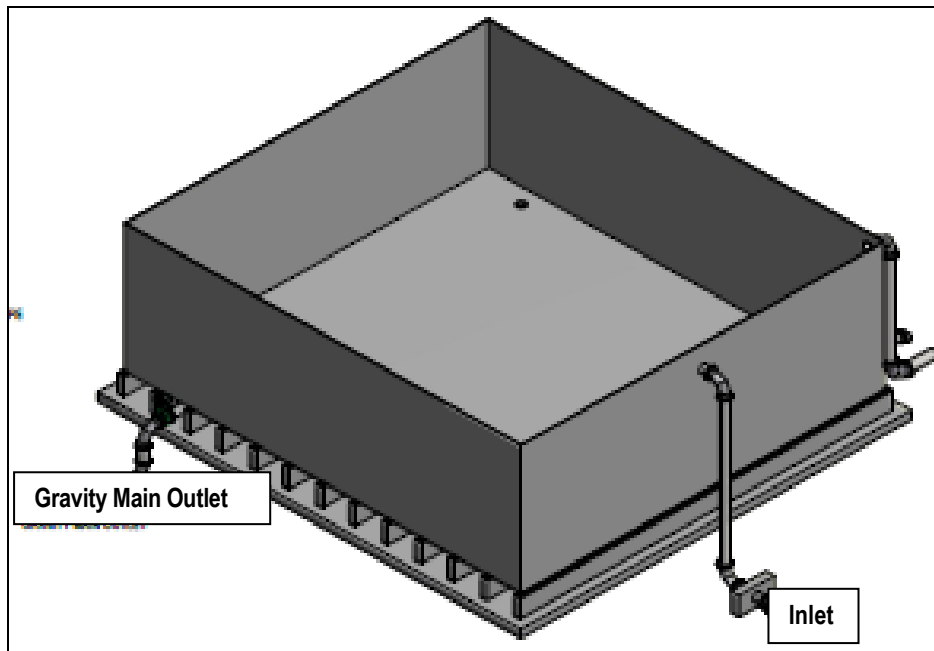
Isometric view of the proposed 1 ML steel reservoir showing the gravity main outlet and inlet
